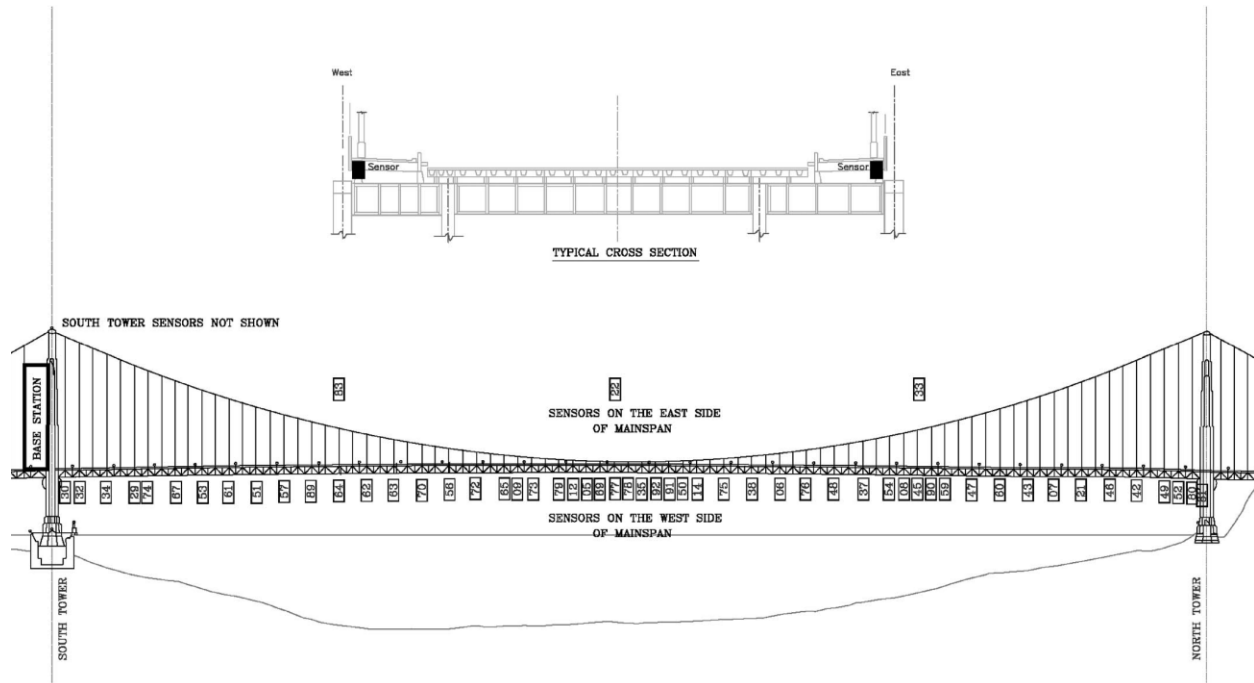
Instrumentation plan for 56 nodes on the Golden Gate Bridge's main span (Pakzad et al. 2008)
